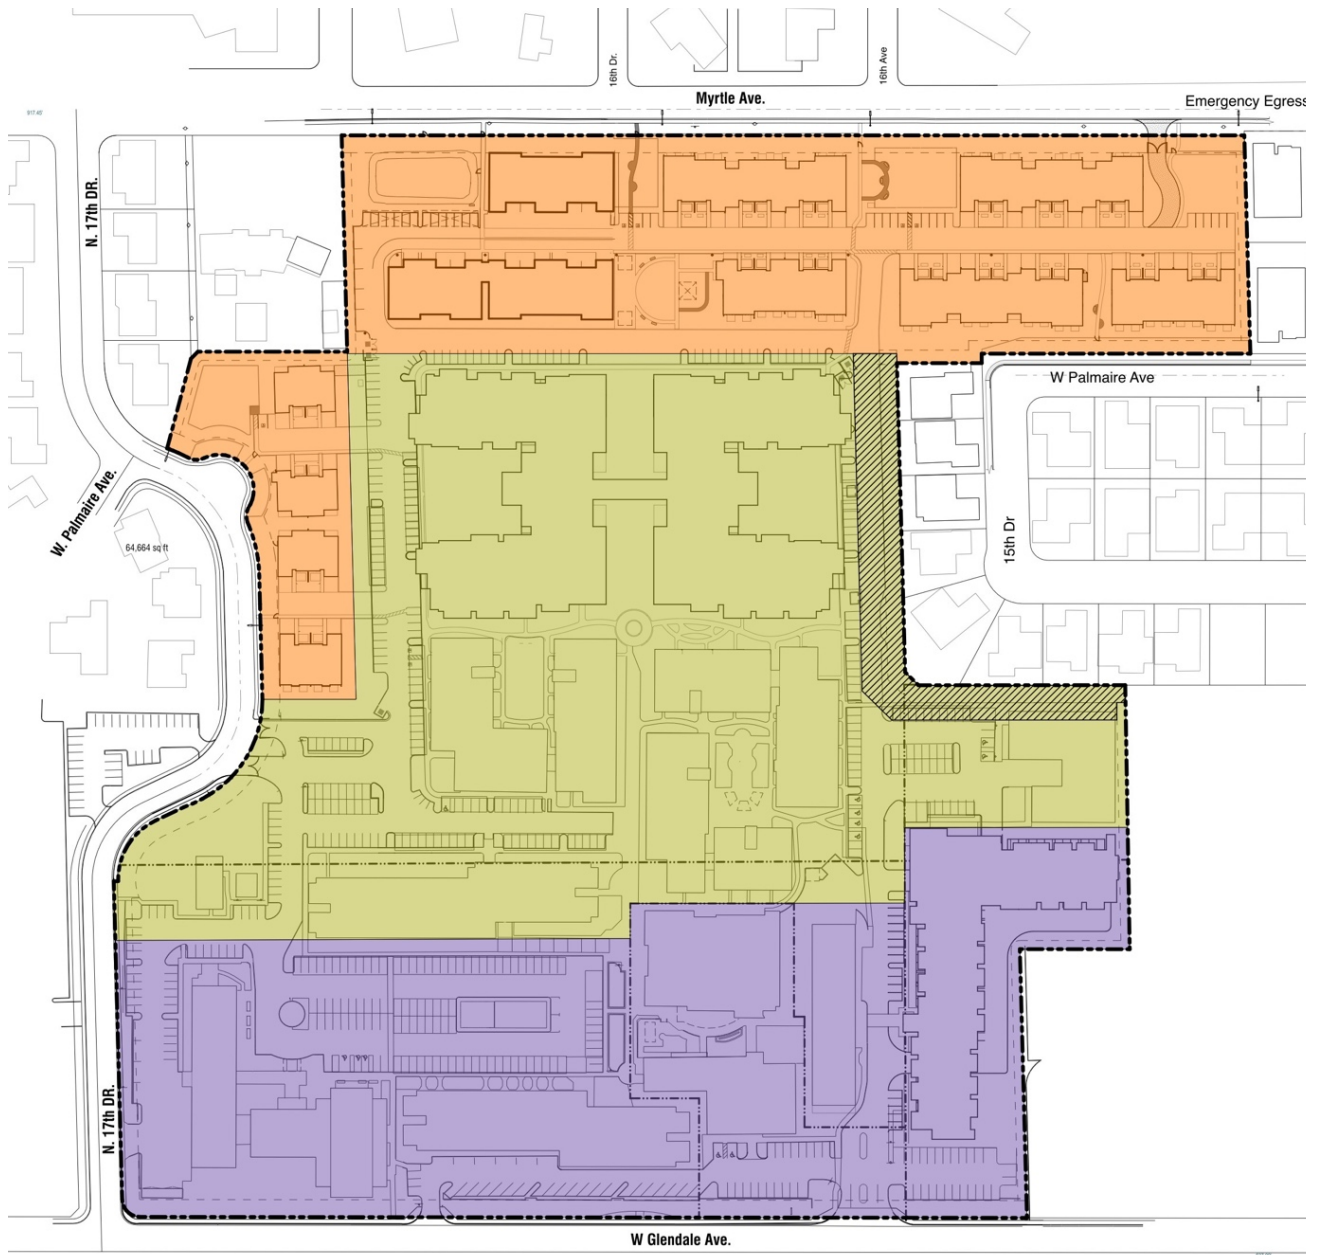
MINIMUM BUILDING SETBACK STANDARDS PLAN
